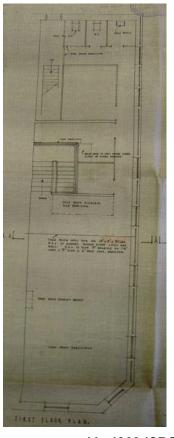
(left) Existing floor plans in 1954 (CRO(B) 19214 1954)
